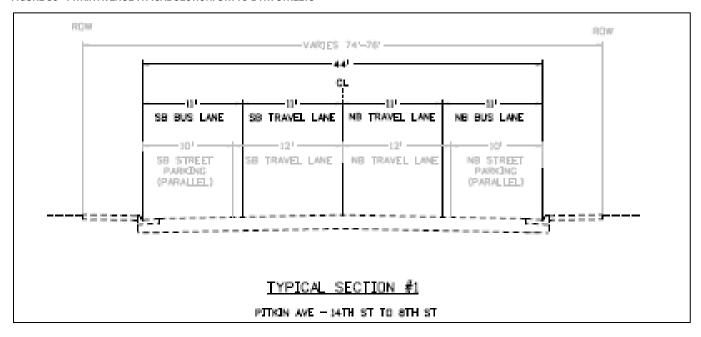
PITKIN AVENUE TYPICAL SECTION: 8TH TO 14TH STREETS
